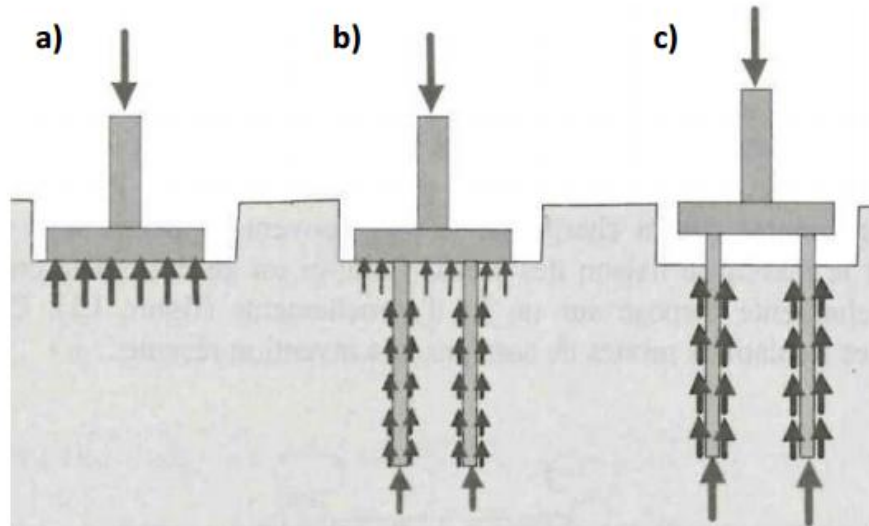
Schematic design of (a) Shallow foundation, (b) Piled raft foundation, and (c) Deep foundation (Borel 2001).
